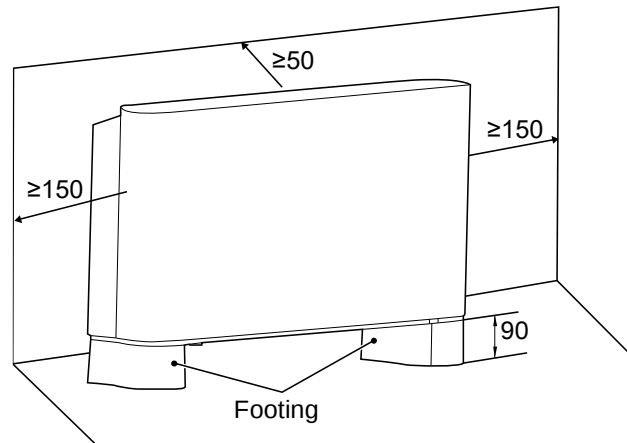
F4 series (air inlet from front) Exposed Floor Standing space requirements (unit: mm)
